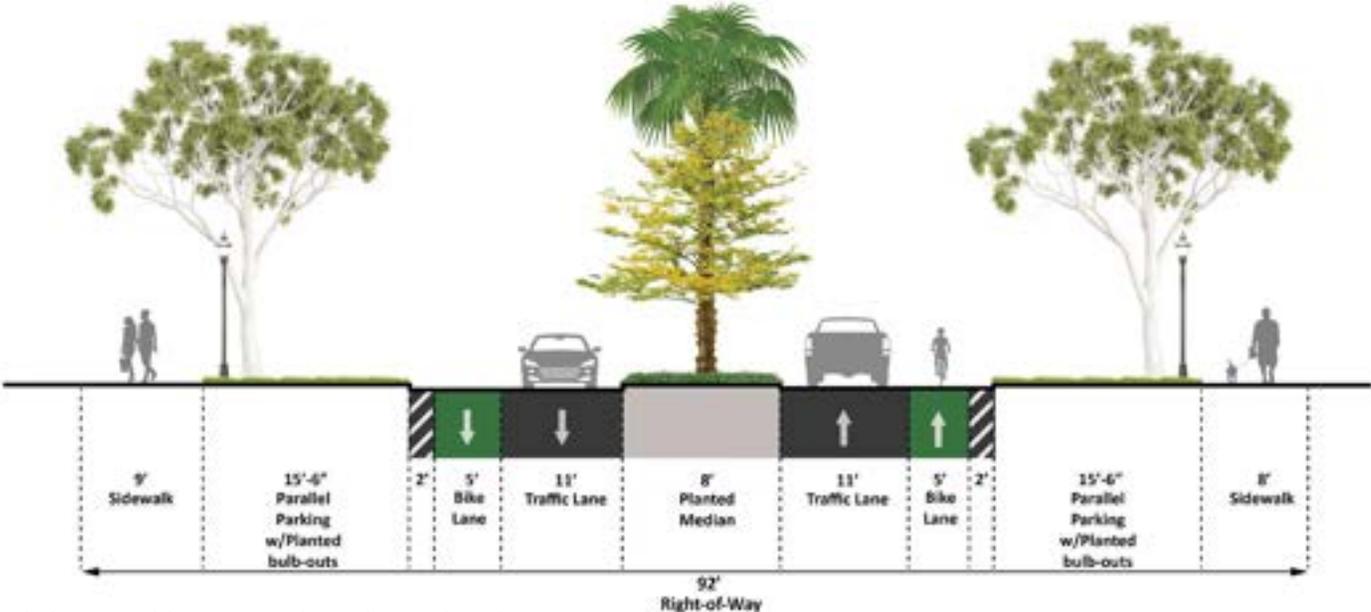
Sixth Street Typical Cross Section (East of Ramona Ave)
